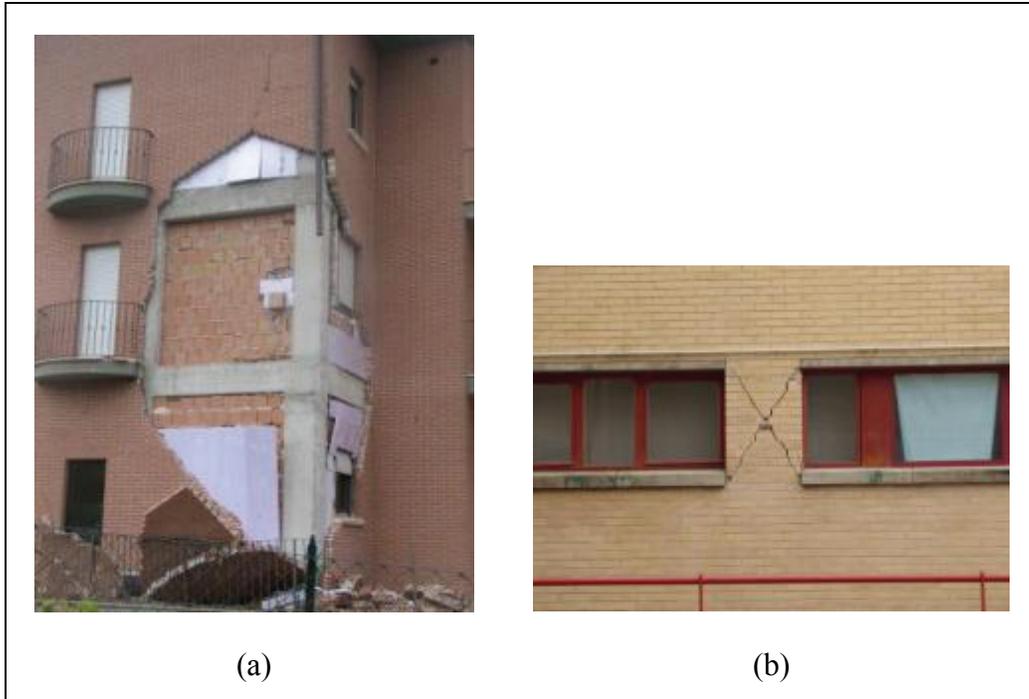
Damage to nonstructural masonry infill walls in Pettino
